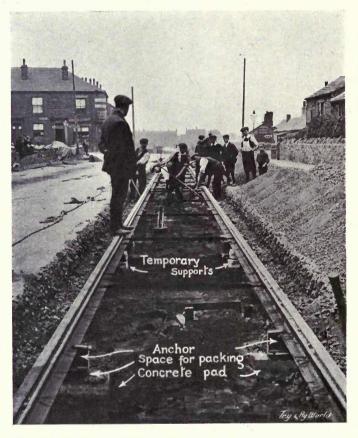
Rails Raised on Temporary Supports, Anchors attached, and the Concrete Pads.
